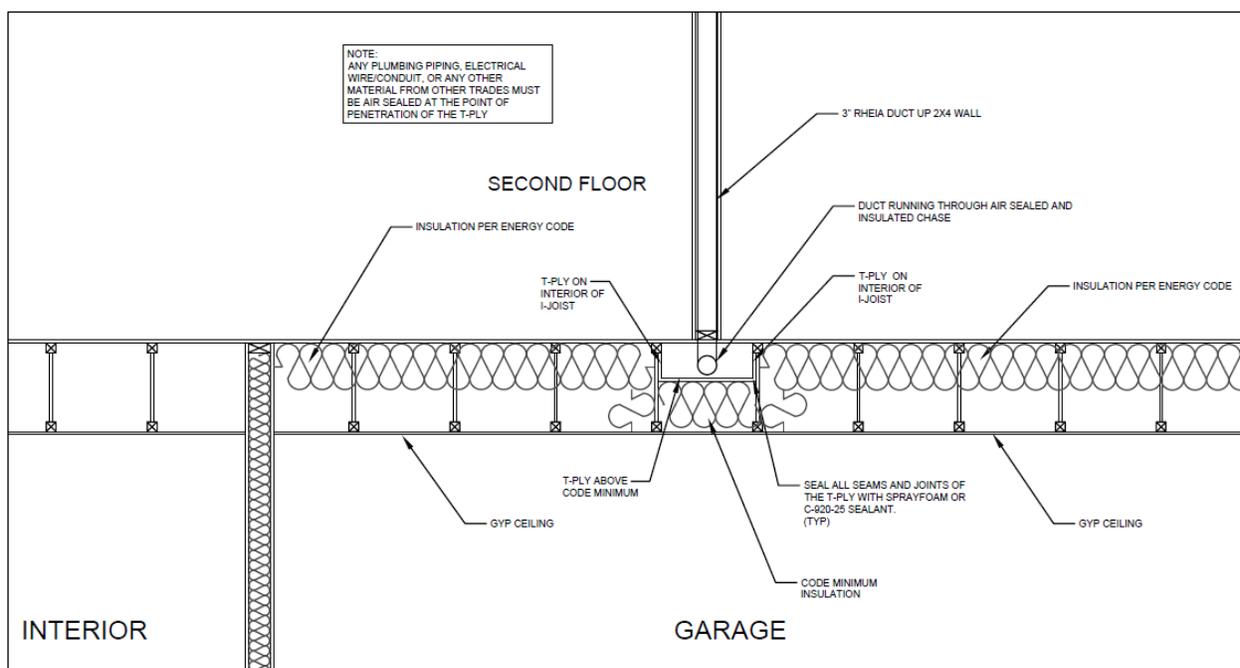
Detail for an air sealed cavity above the garage to route ducts to rooms above a garage.
